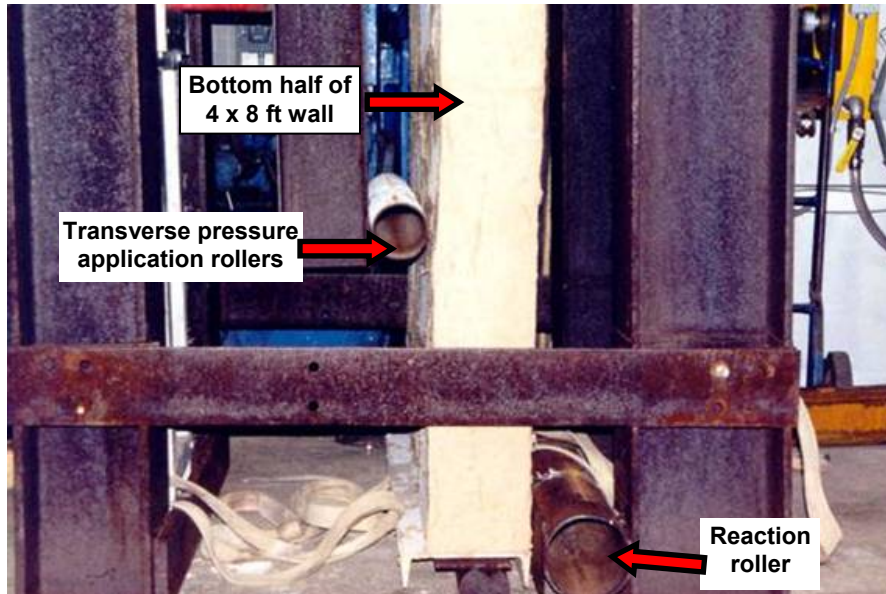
Close up view of sections of pipe used as reaction roller to avoid rotational restraint as the wall deflects from application of transverse pressure.
